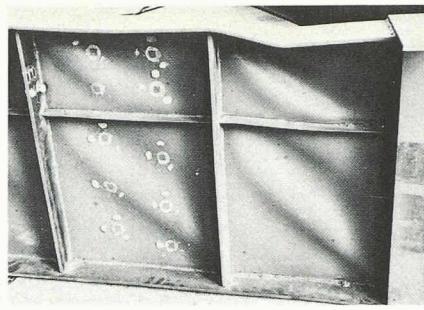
Typical collapse of a girder with one longitudinal stiffener.
